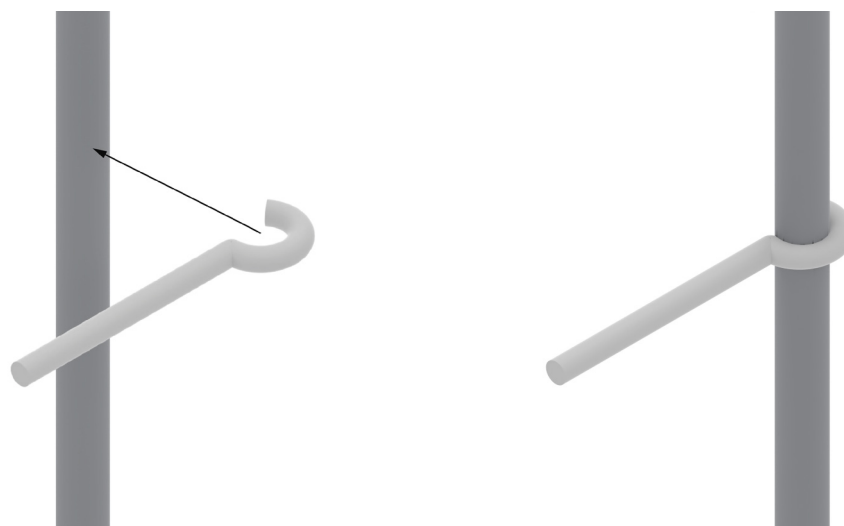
Shear dowel connection detail for column jacketing (left) before connection with the longitudinal rebar (right) after connection with the longitudinal rebar (author's own work)
